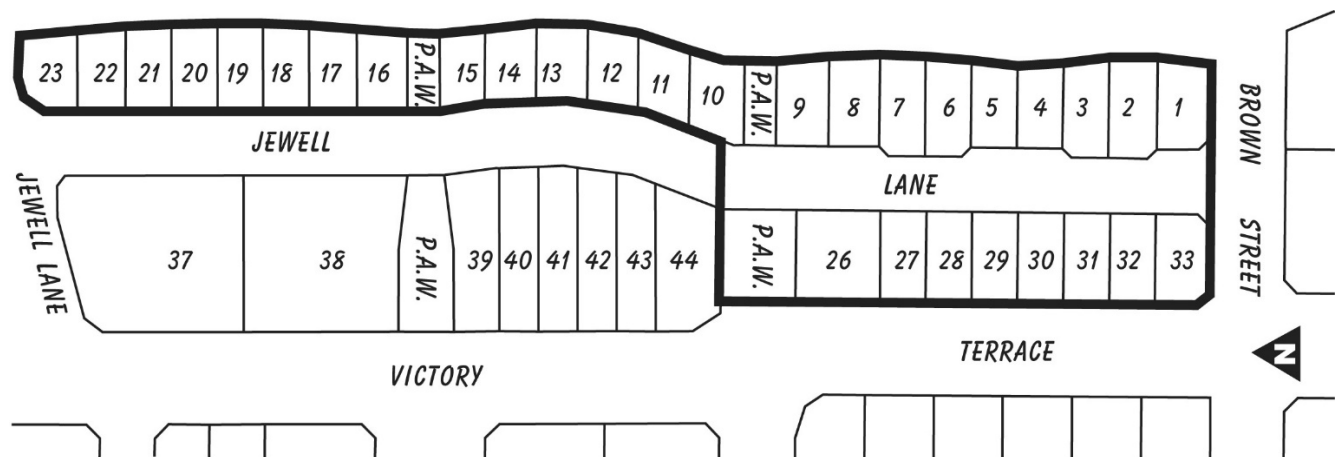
Lots 1 to 23 Jewell Lane, Lots 26 to 33 Victory Terrace and Lots 37 to 44 Victory Terrace (Lots 37 to 44 Victory Terrace subject of separate Design Guidelines).
